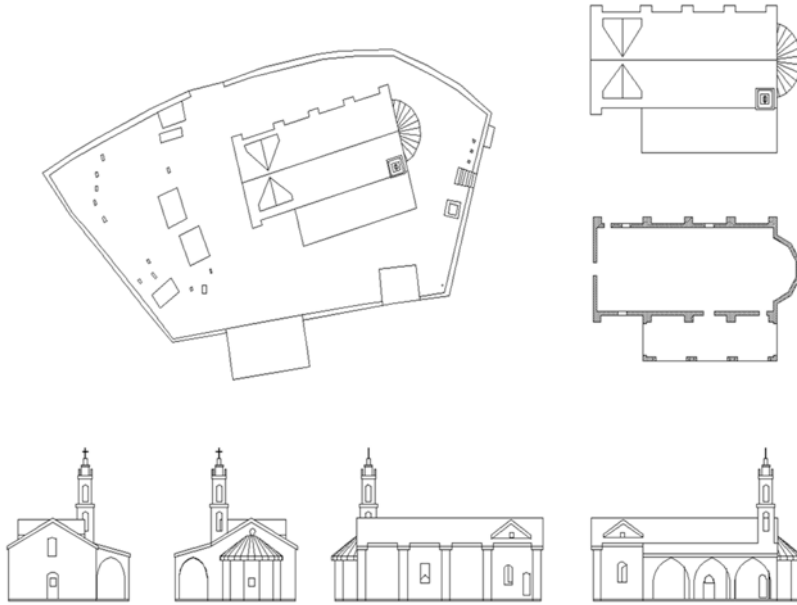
Drawings of plans and elevations extracted from the BIM model
